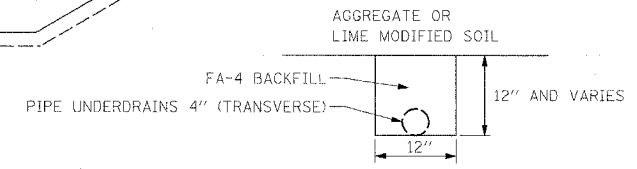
DETAIL - EASTBOUND MAINLINE PIPE UNDERDRAINS 4" (TRANSVERSE)
